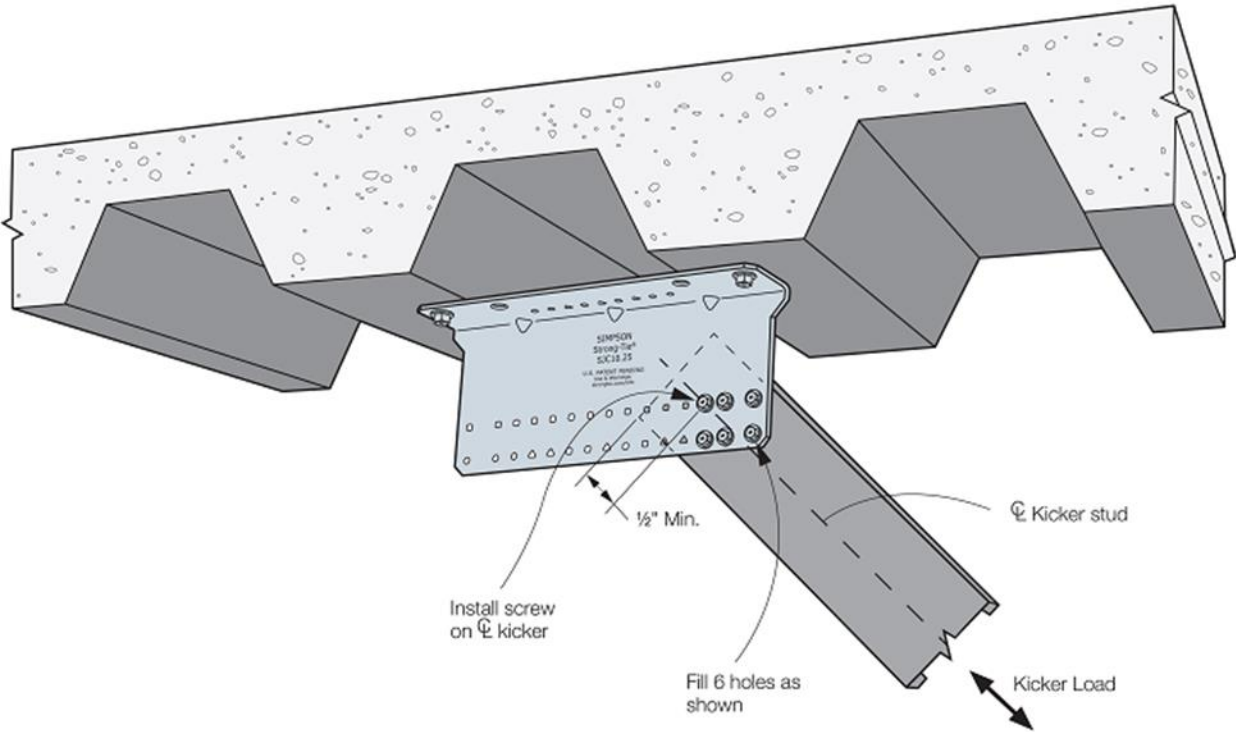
B—SJC SERIES CONNECTOR KICKER APPLICATION INSTALLATION DETAILS
